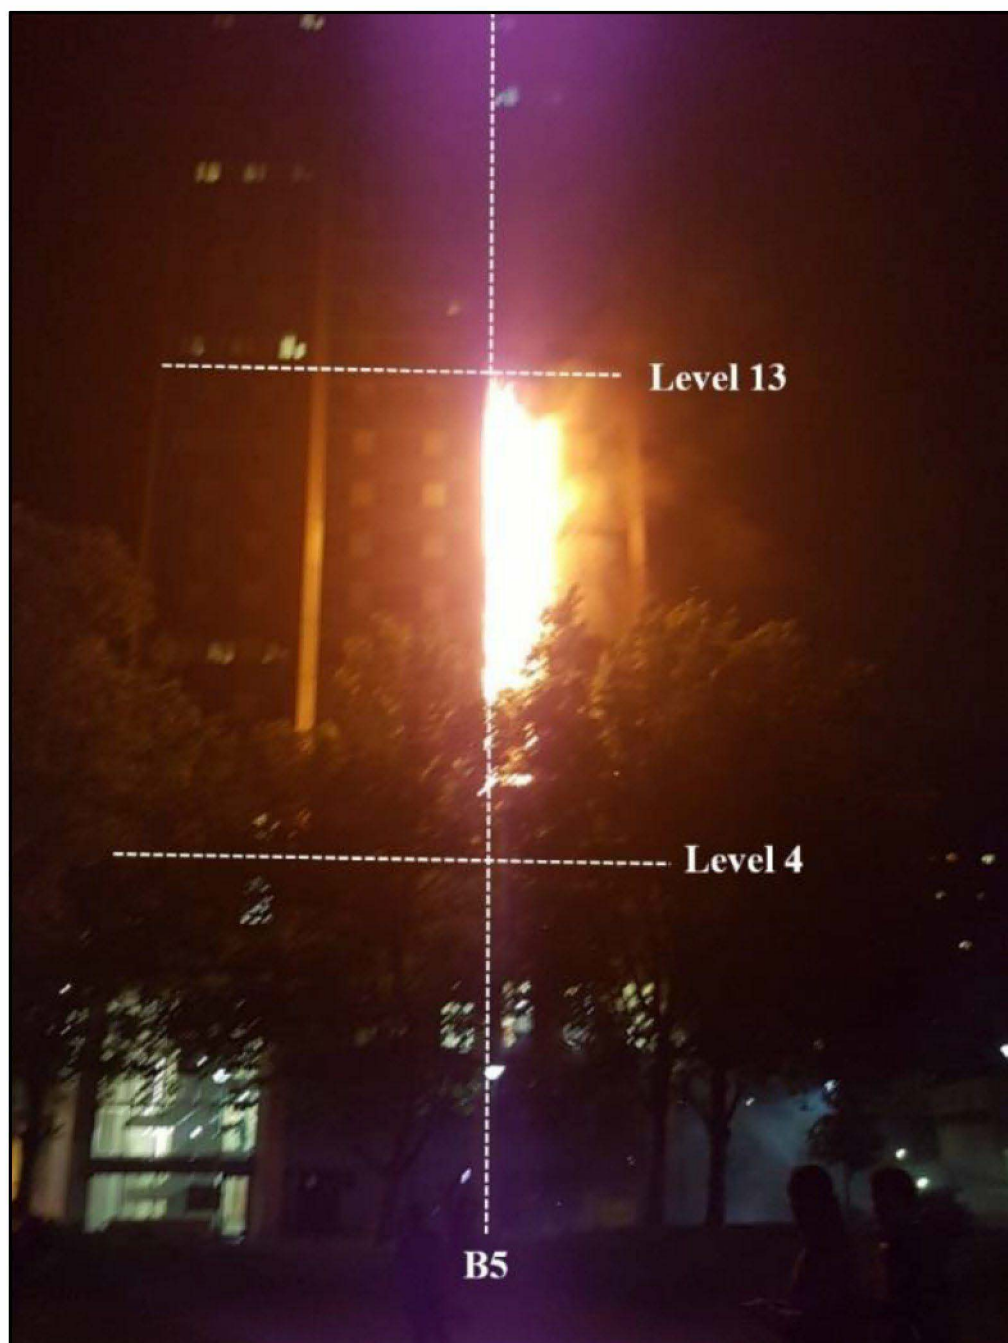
Fire on East elevation of the building envelope at 01:22 on 14<sup>th</sup> June 2017 (MET00012593)
